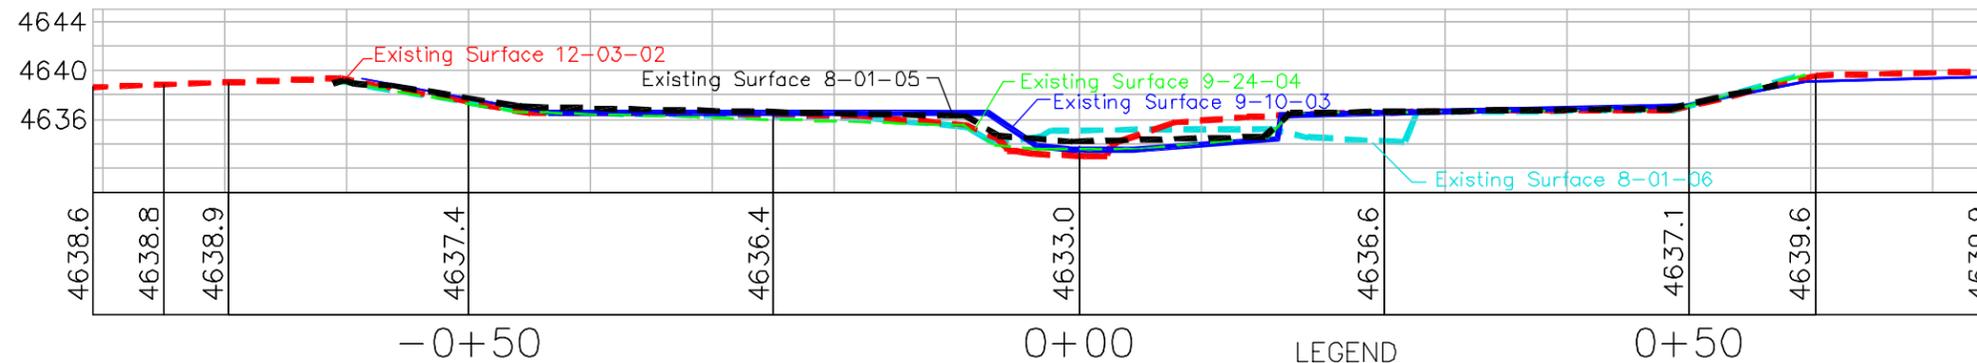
CAMP CREEK CHANNEL CROSS SECTIONS PLANTING SPECIFICATIONS
